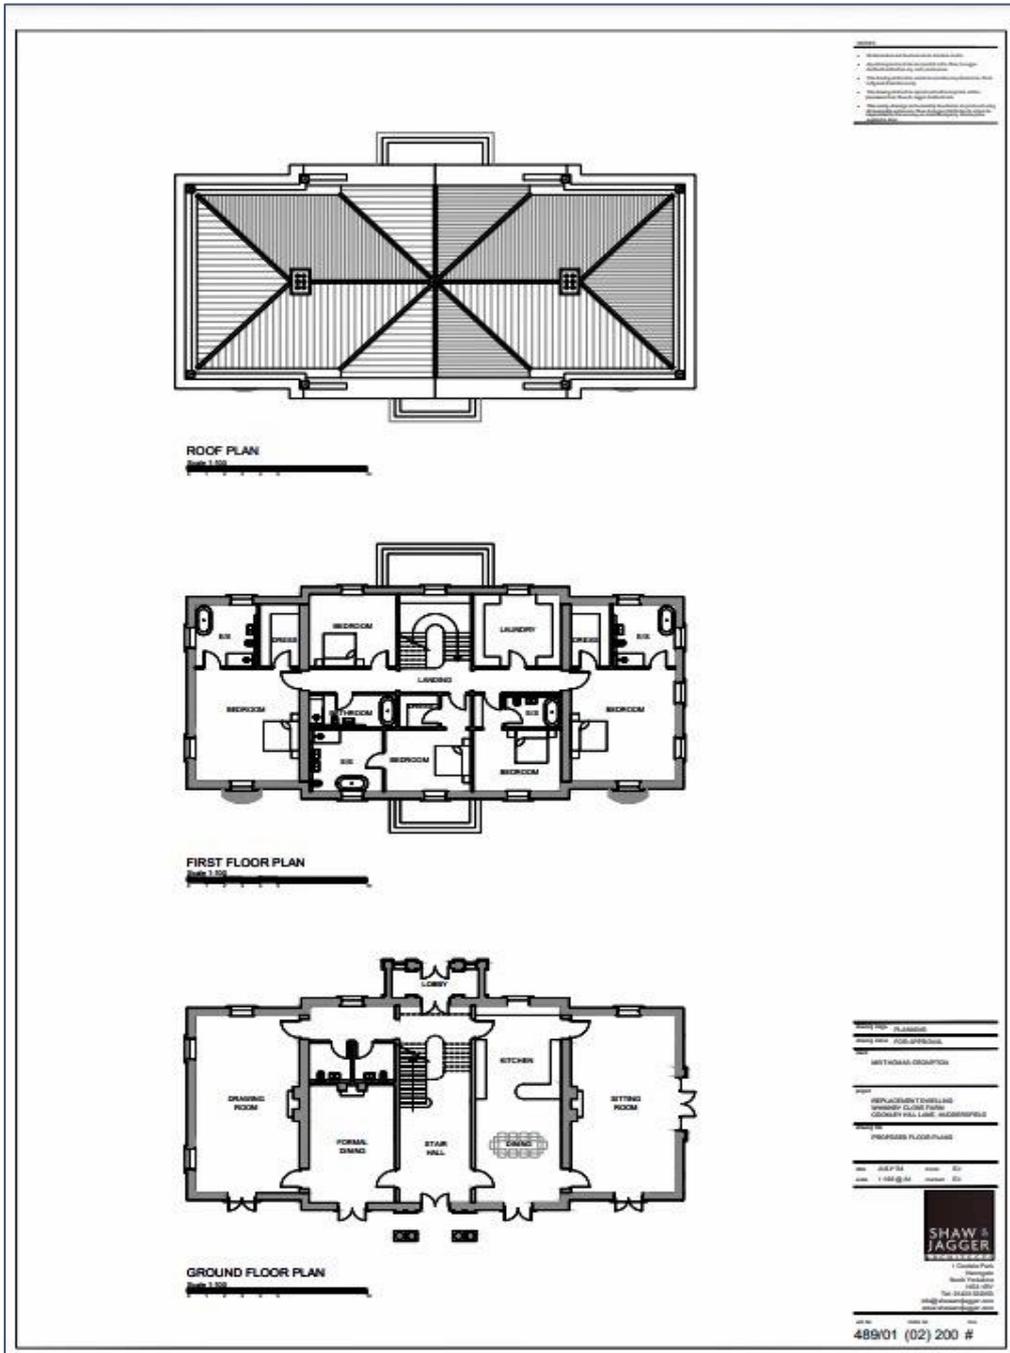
Proposed floor layouts. Shaw & Jagger Architects Ltd., July 2024.
